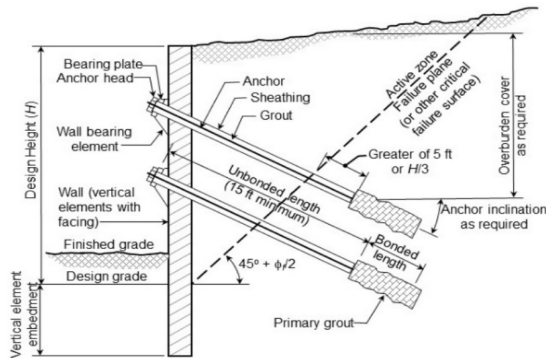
Anchored Wall Nomenclature and Anchor Embedment Guidelines
